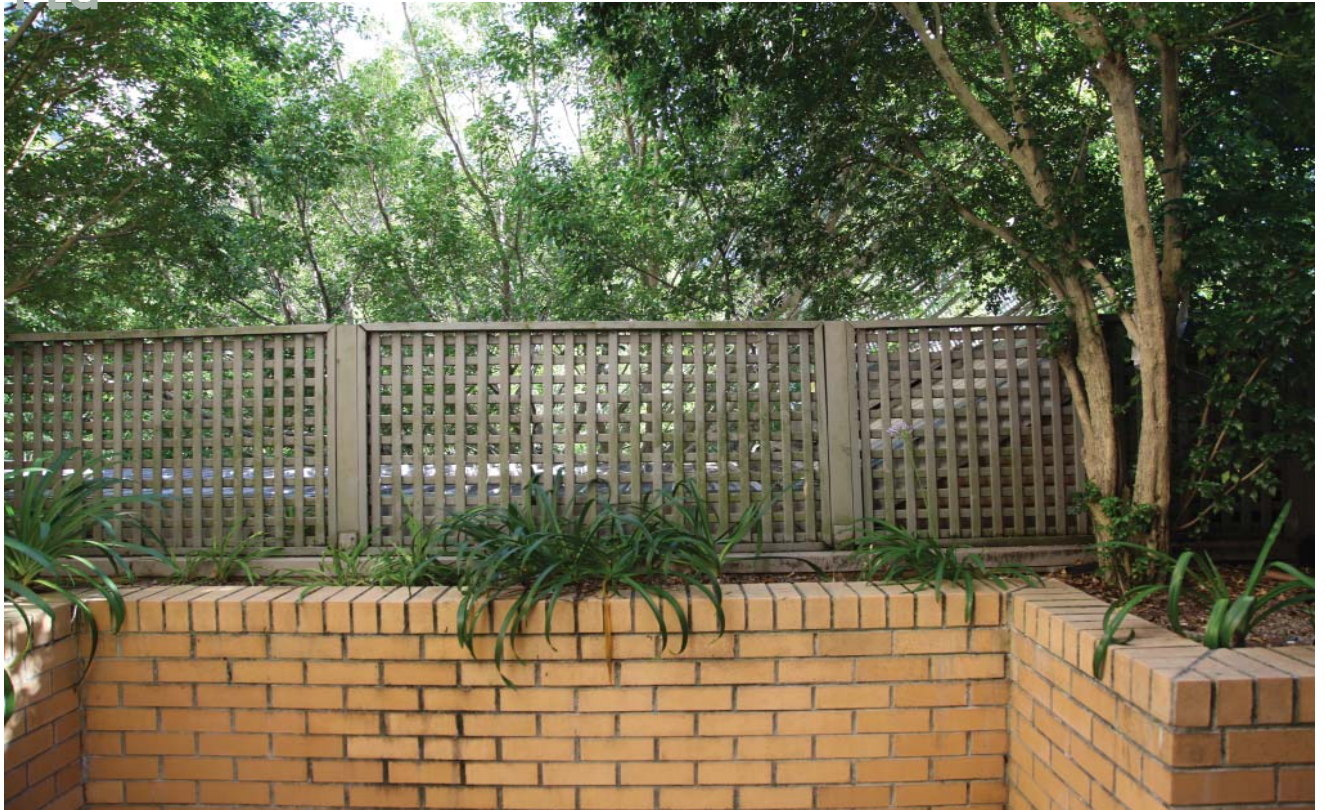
Ground Floor Apartment 12: View south across courtyard space
